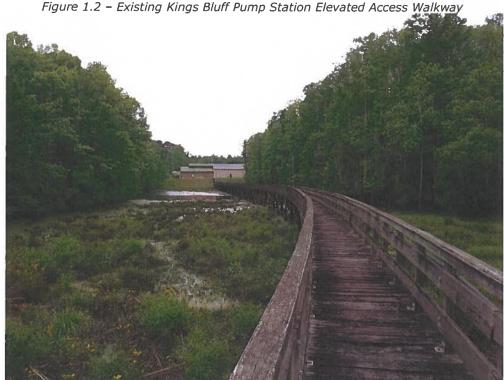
Existing Kings Bluff Pump Station Elevated Access Walkway
